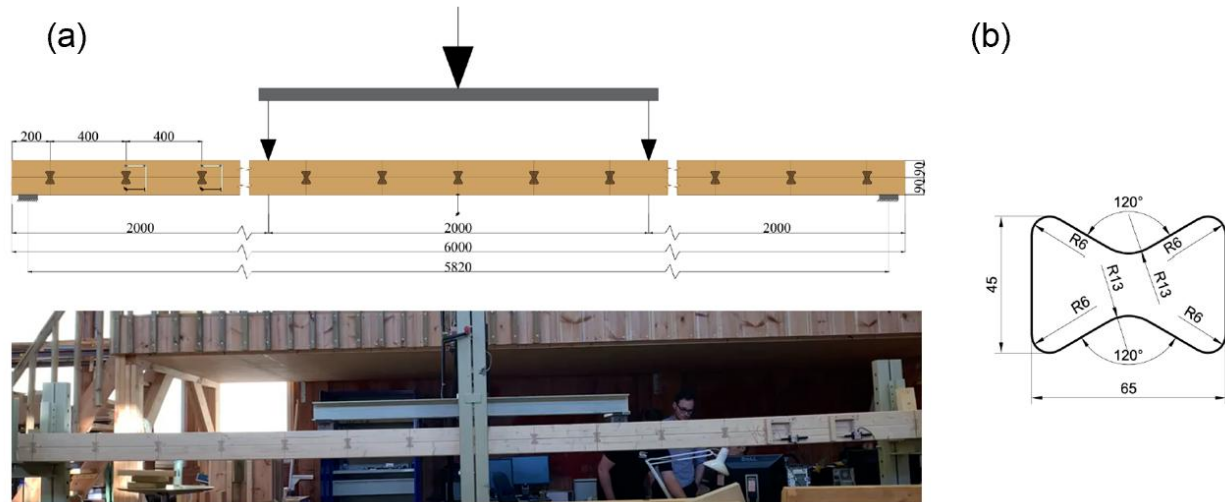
(a) Bending test setup and (b) cross-section of the wooden connector (unit in mm) (Schickhofer, 2025)
